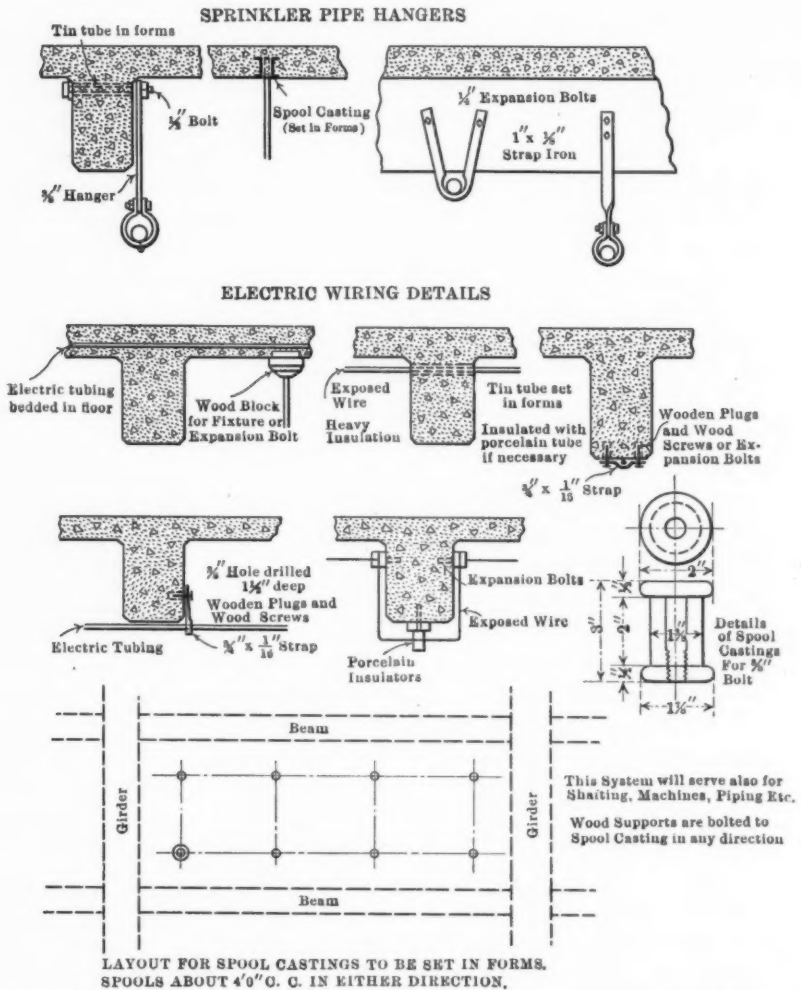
METHODS OF INSTALLING SPRINKLER PIPES, ELECTRIC WIRING AND MACHINERY IN CONCRETE BUILDINGS
